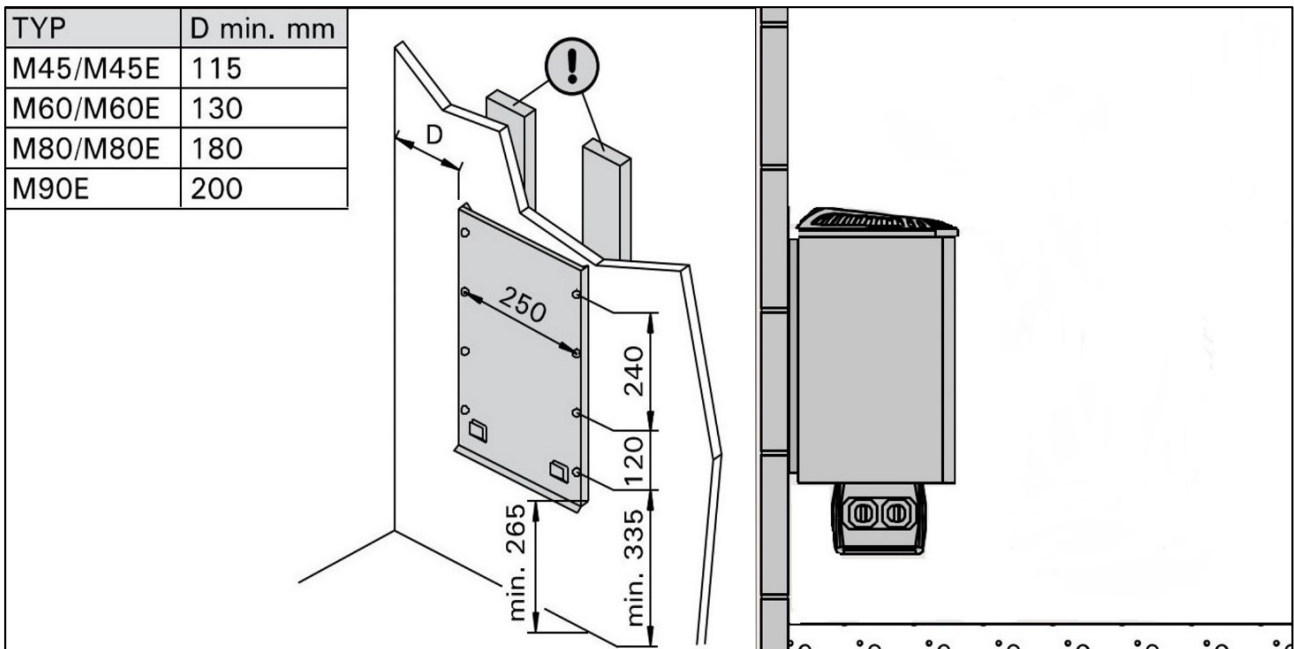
The image shows the installation instructions for the mounting rack on the left and the sauna heater mounted on the wall using the mounting rack on the right. (Images: Harvia)
